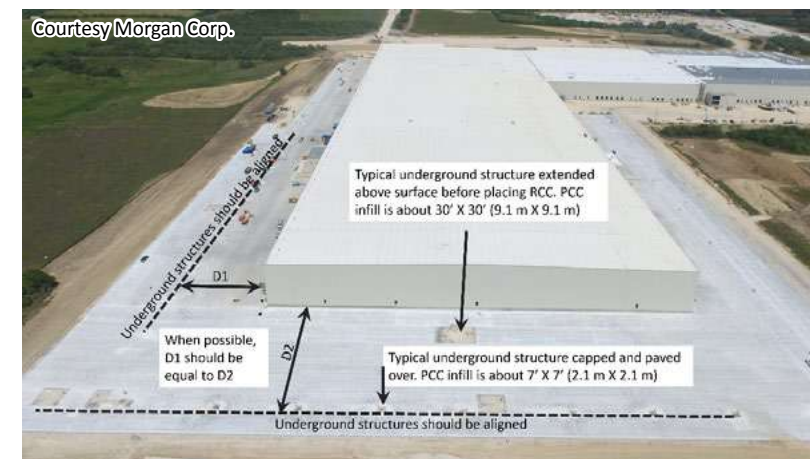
Recommended details when the structures must be within the field of the RCC pavement. PCC denotes Portland cement concrete or conventional concrete.
